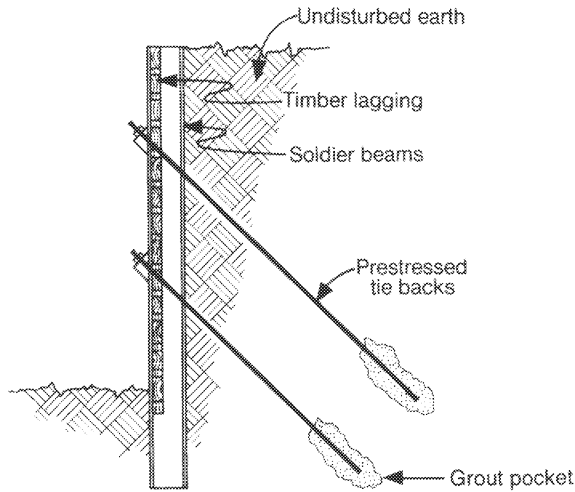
Typical detail of a soldier beam retaining wall stabilized with tiebacks.
